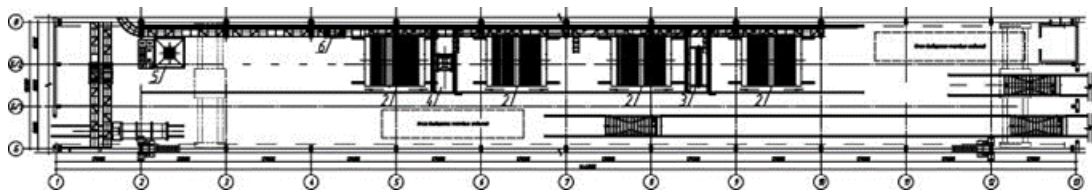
Forming plan of span No. 2 (3rd launch complex modernizations): 1 – line cluster line; 2 – battery; 3 – the machine cleaning and lubricating cassette; 4 – paver; 5 – post washing concrete paver; 6 – Kubel targeted concrete supply)
